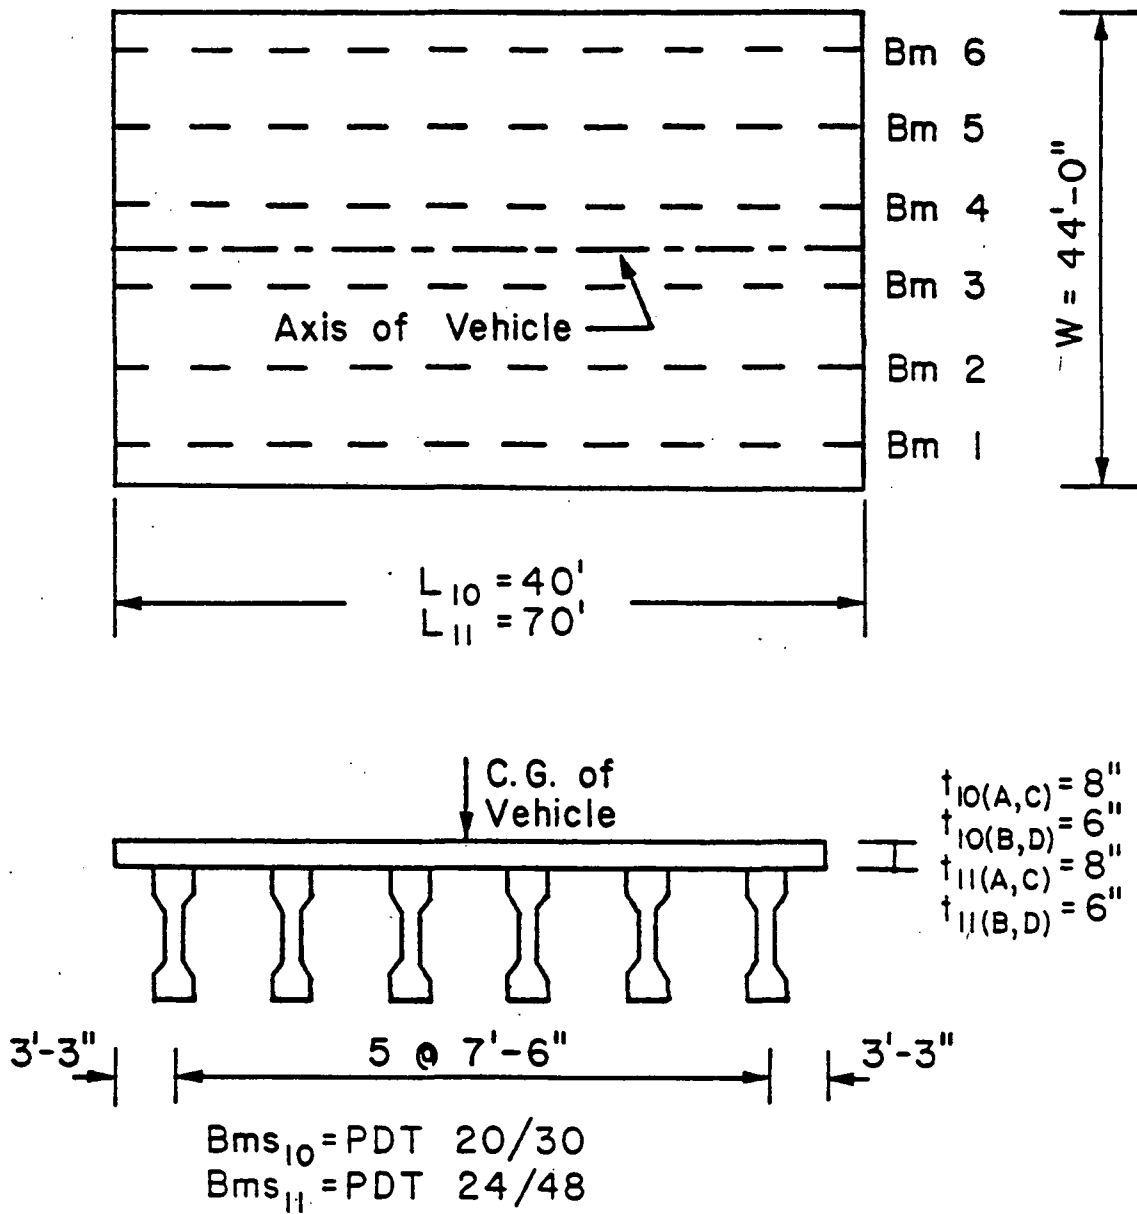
Plan and Cross-Section of Bridges 10 and 11
